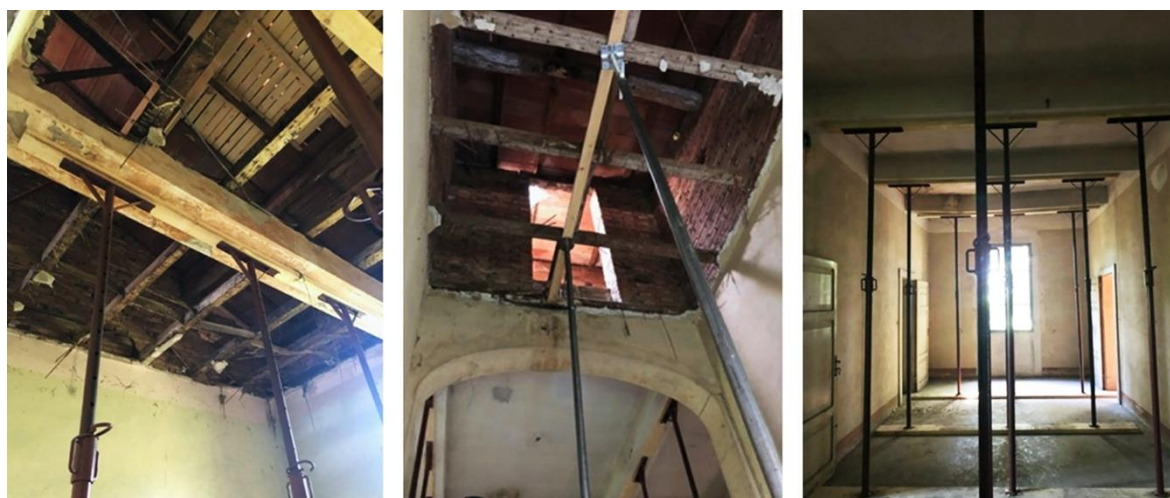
Internal views of the wooden roof structure and floor slabs (© 2020, Mazzoli, C.).
